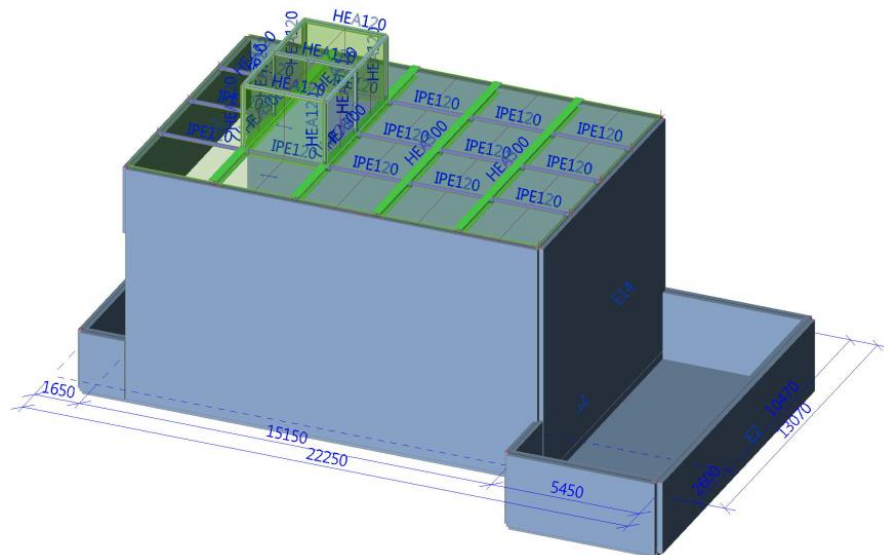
3D model SCIA Engineer Sawdust feeding building
